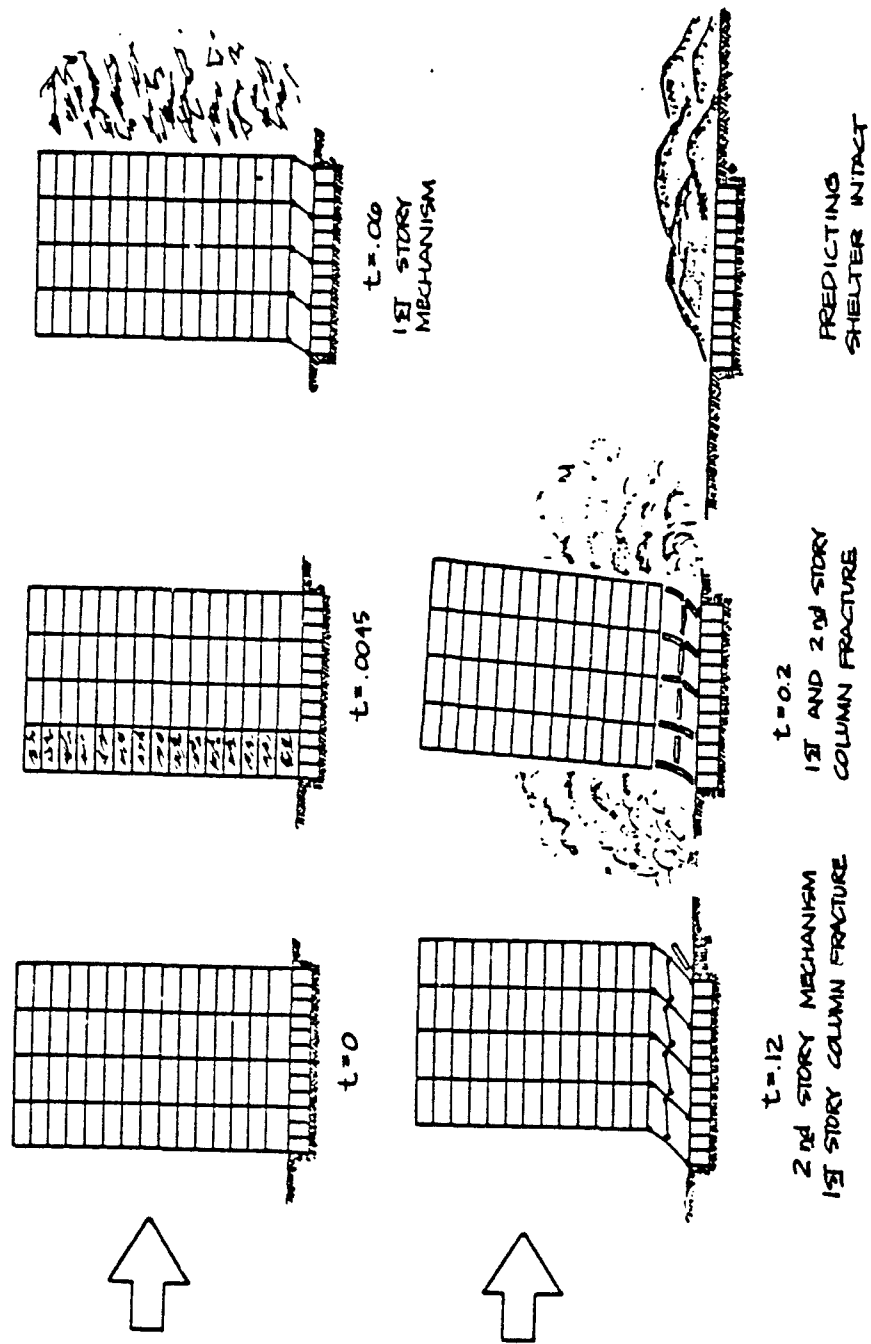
Phases of Structural Failure, Continental Life Building, Atlanta, Georgia.
